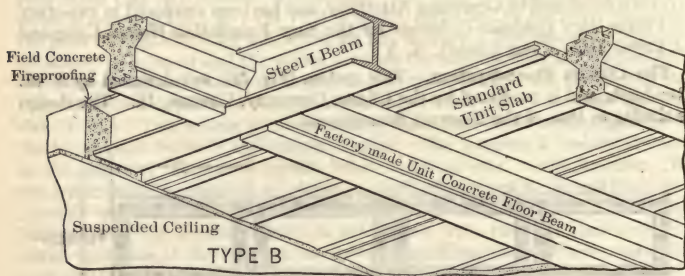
Watson Reinforced-concrete Floor-construction. With Slabs
